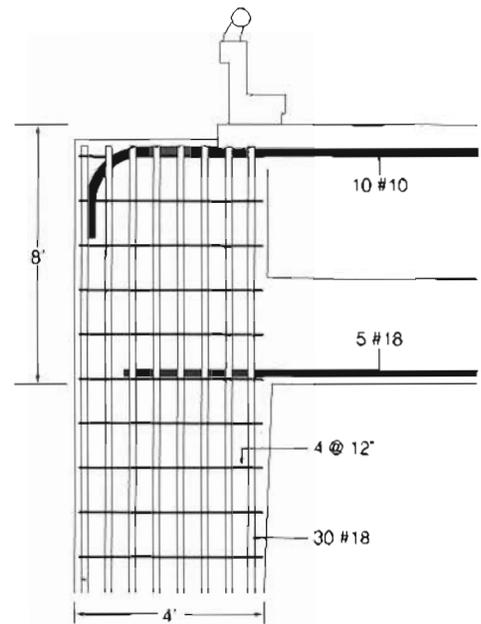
Typical connection detail 4—B1 bent upper girder-to-column connection.
